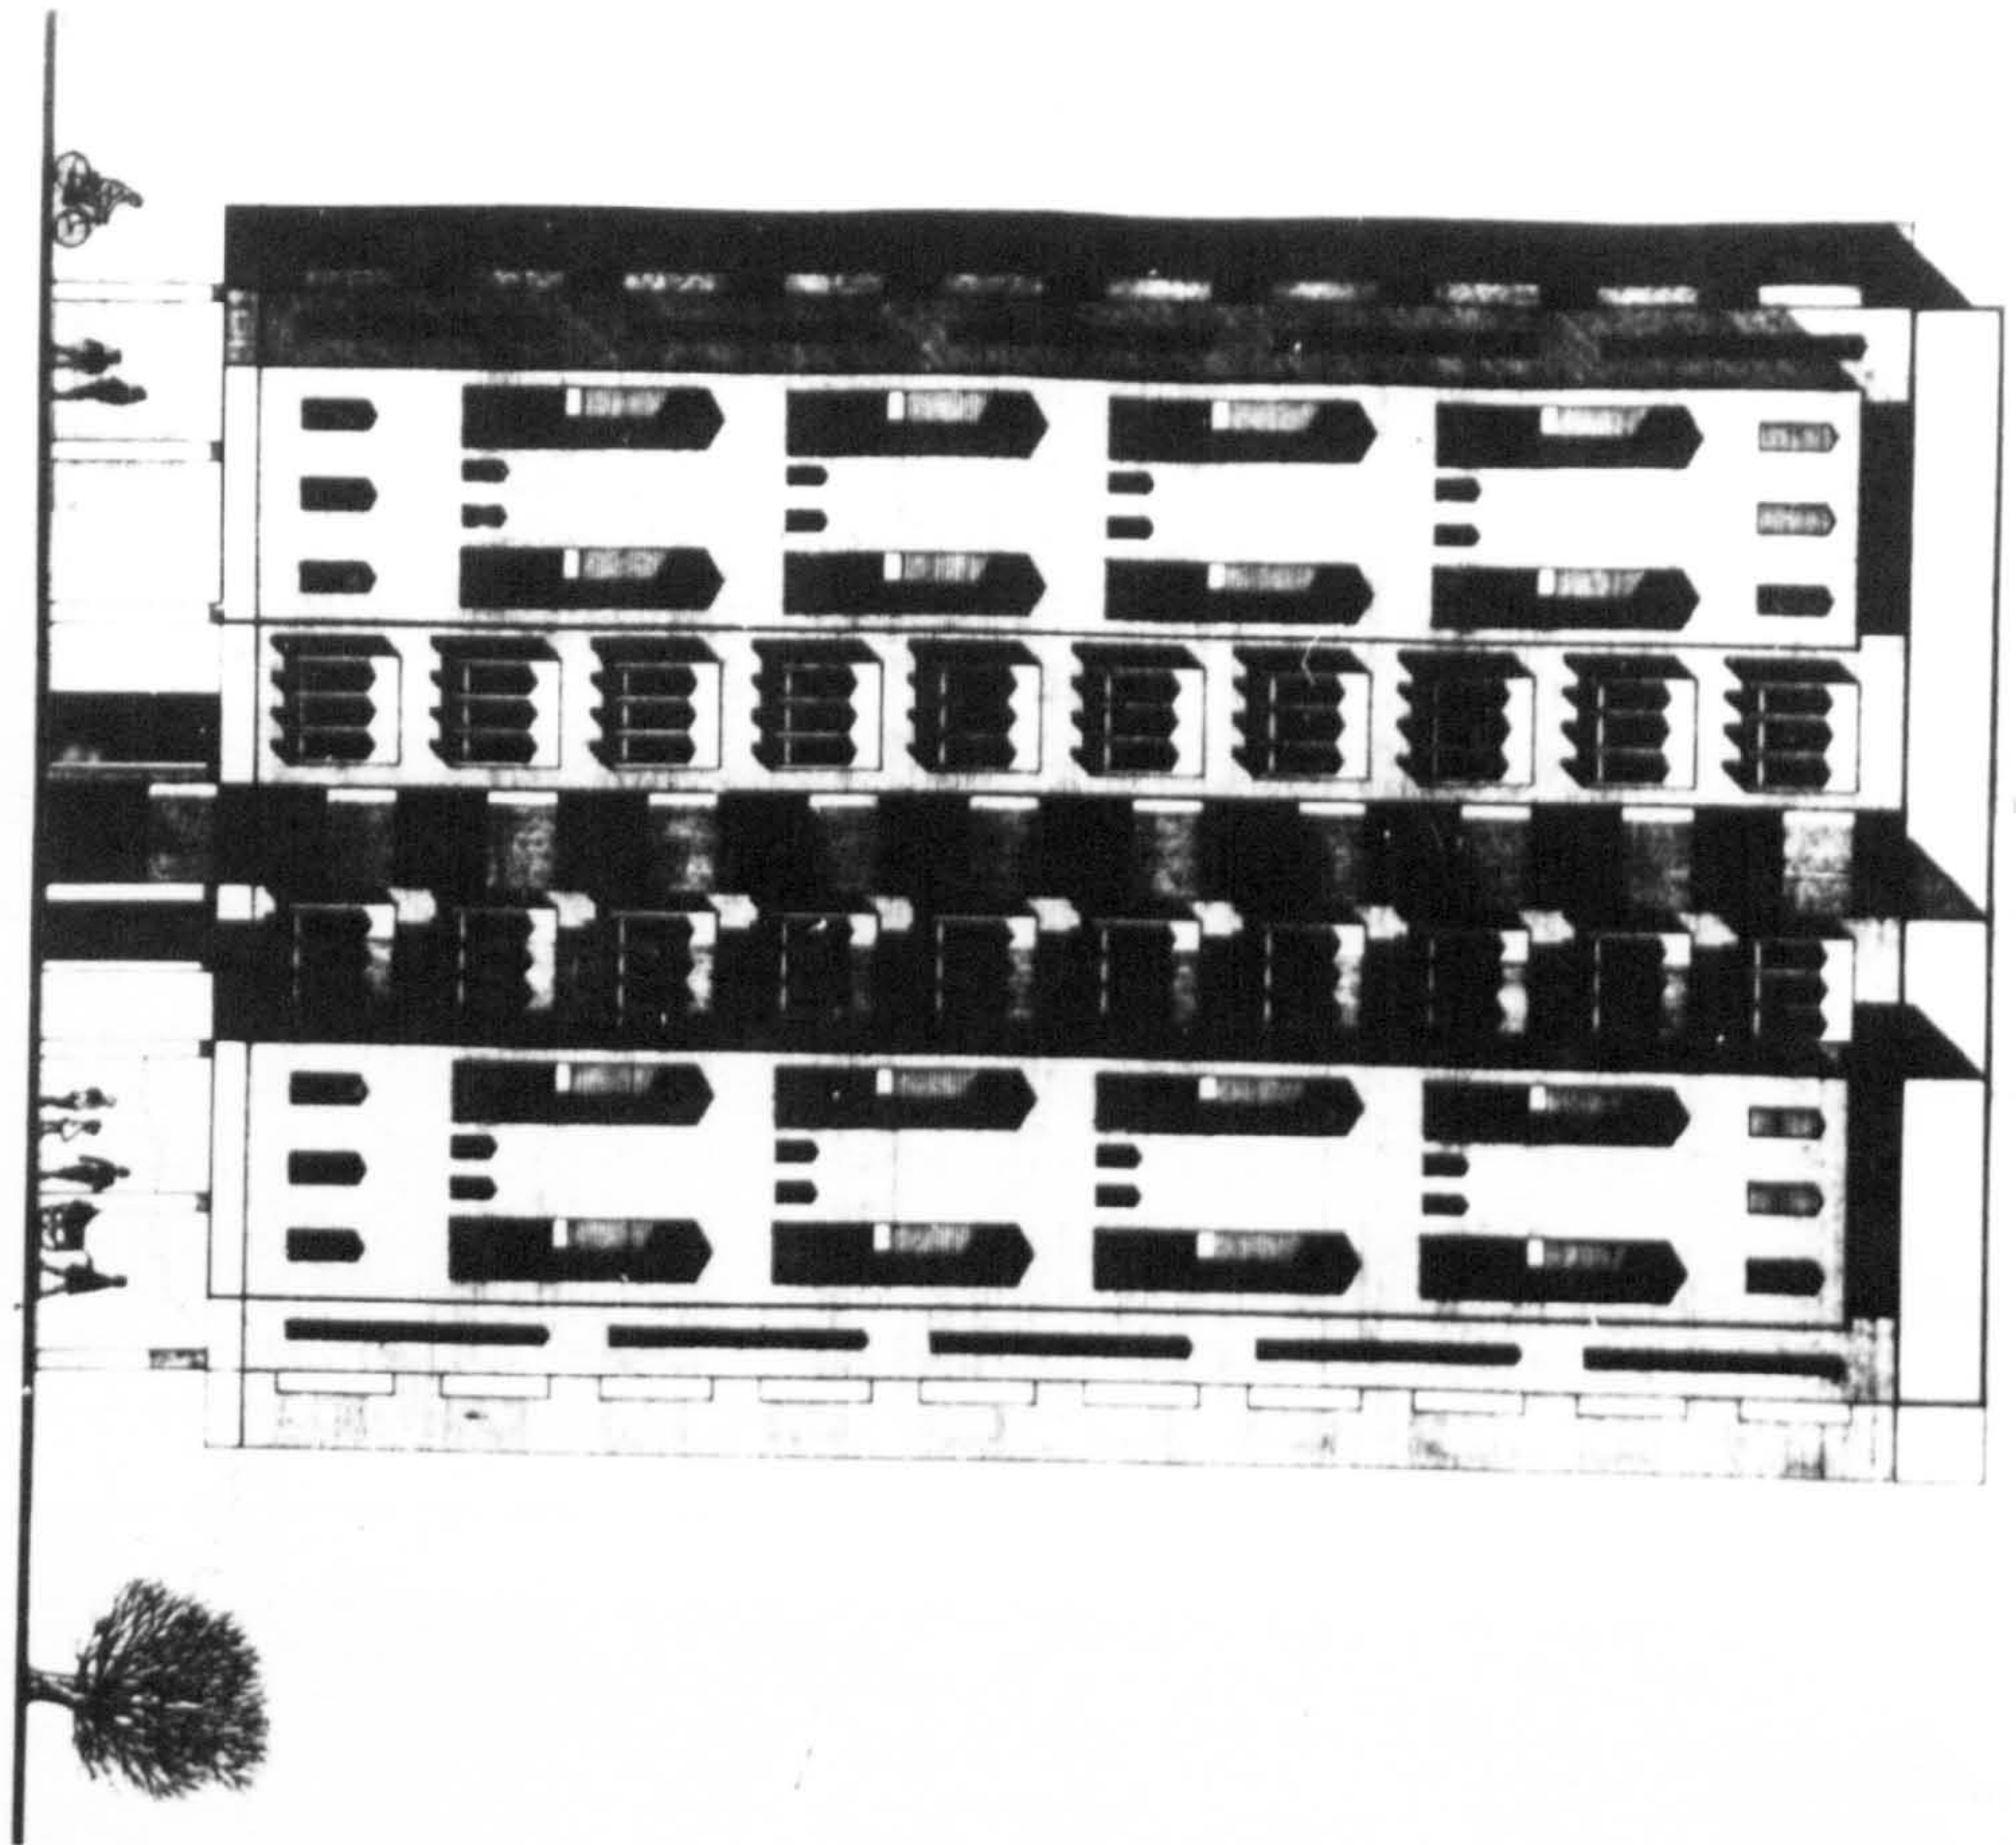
ELEVATION AND SECTION OF BLOCK
